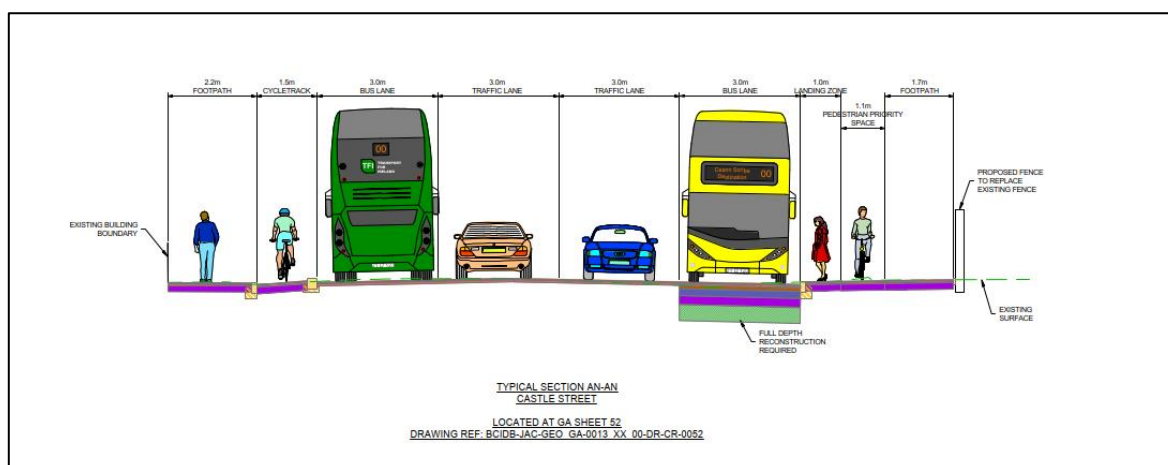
Extract from Typical Cross-section Drawing (Sheet 22)
